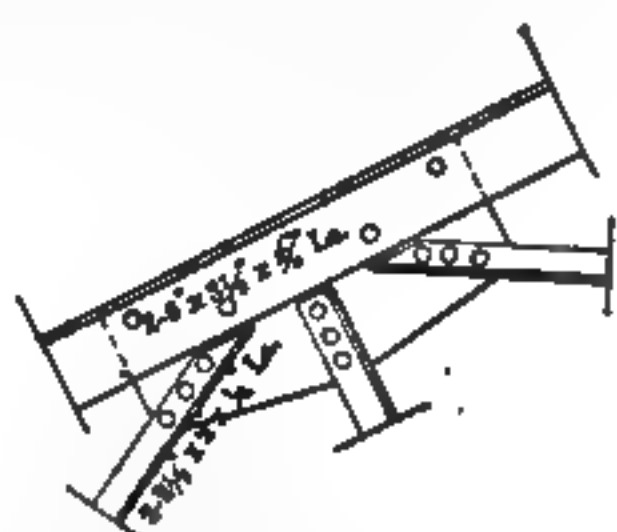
A. Detail of Joint D, Fink Truss, Fig. 7
